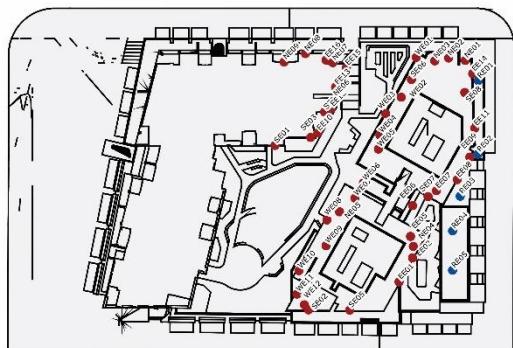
Layout of Pressure Sensors – Level 3 Plan
